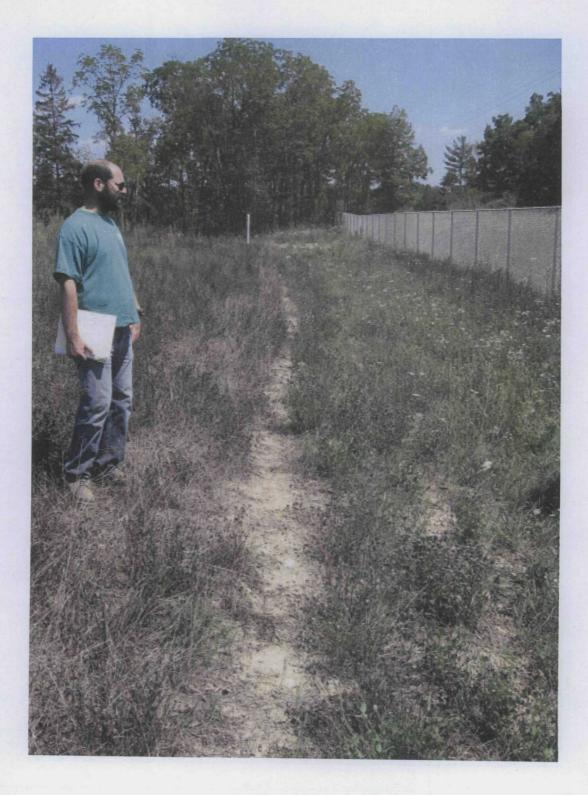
Stressed vegetation and erosion in southwest surface water swale
